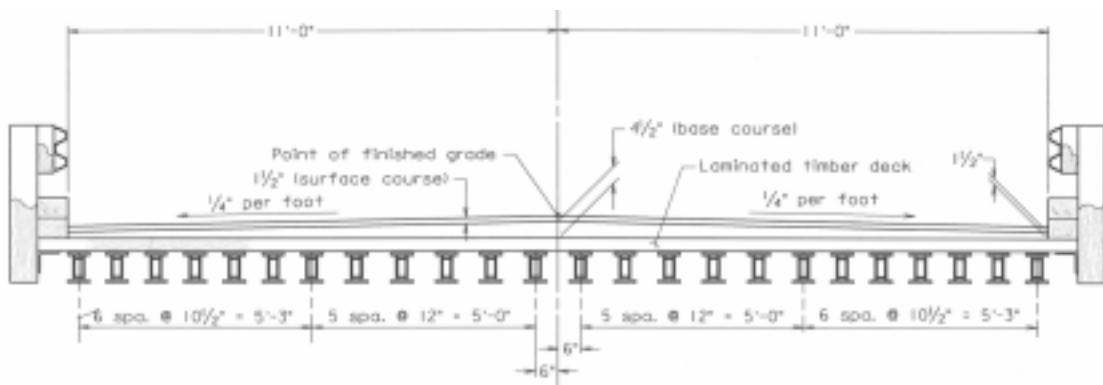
Transverse view from design plans for rehabilitated bridge structure showing placement of composite beams [60].
